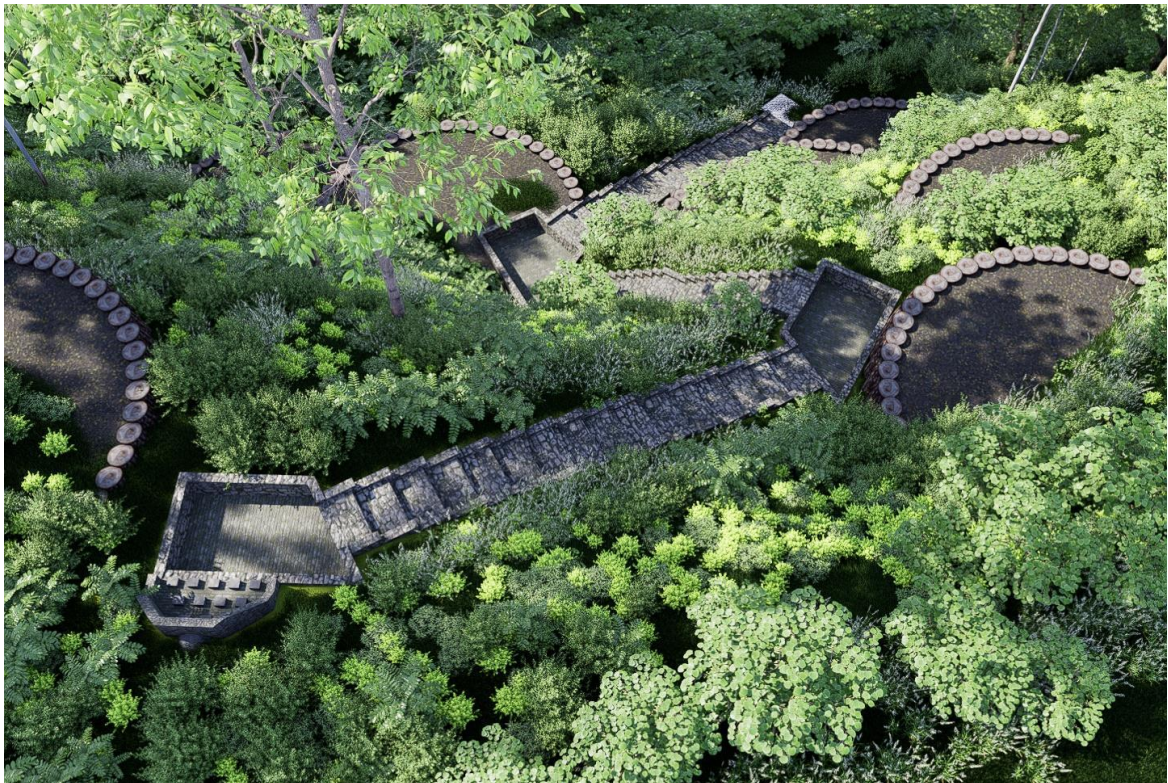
Elevated top view of the proposed stilling pond and water stair system.
